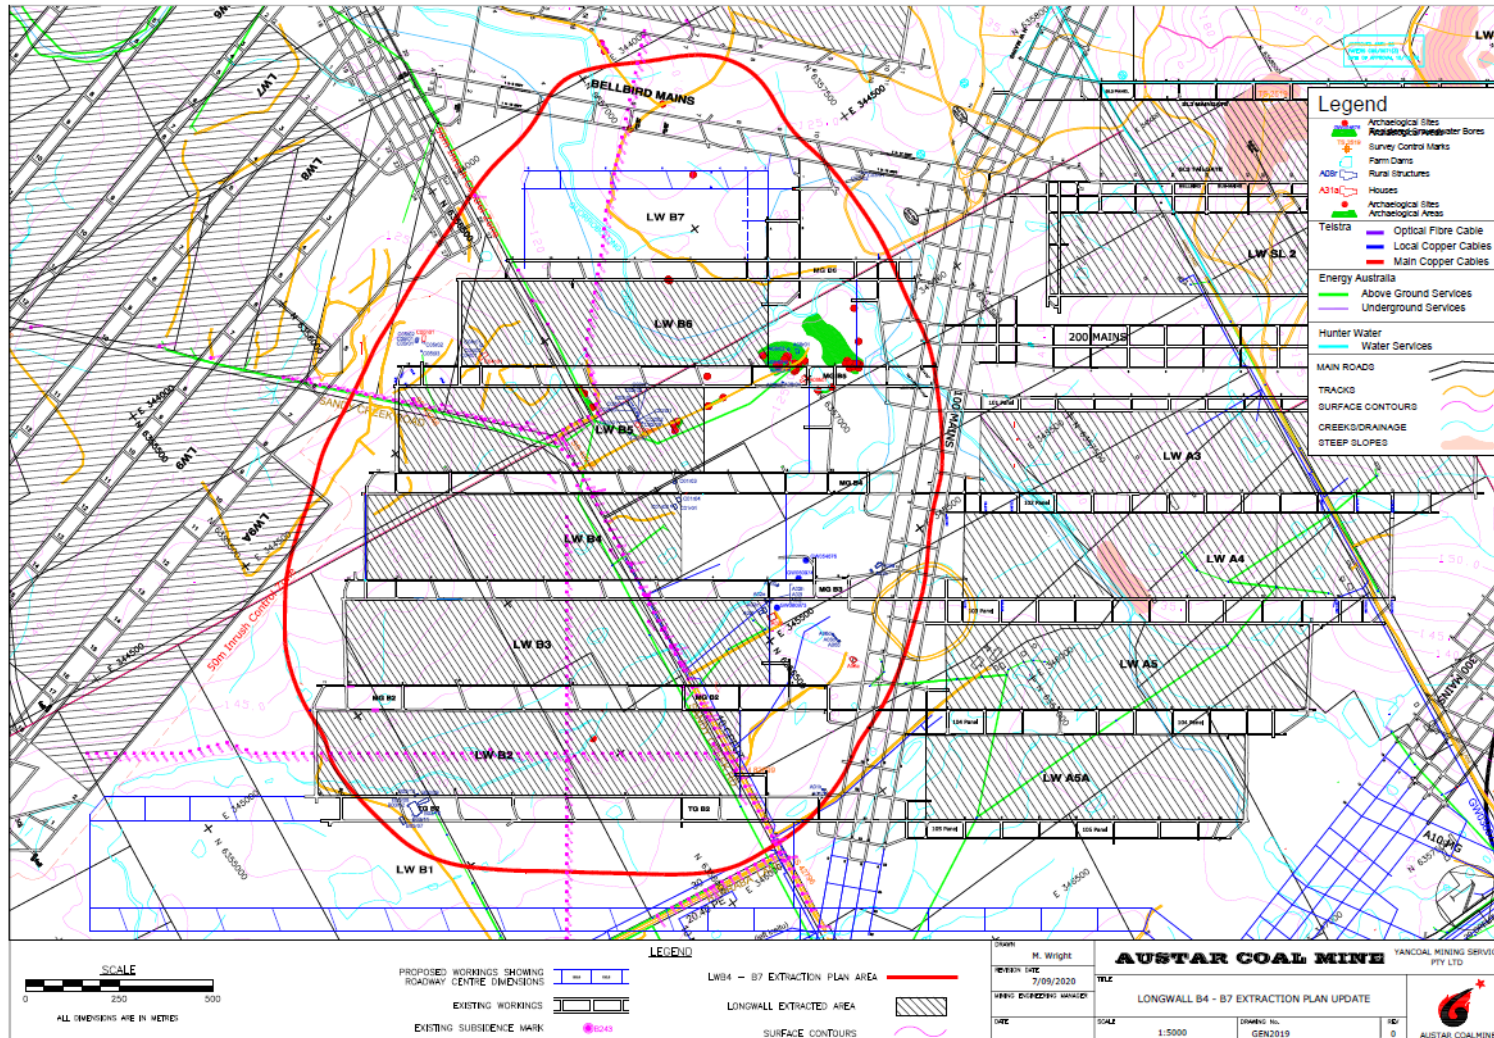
SUBSIDENCE MONITORING SURVEY PLAN BELLBIRD SOUTH AREA
